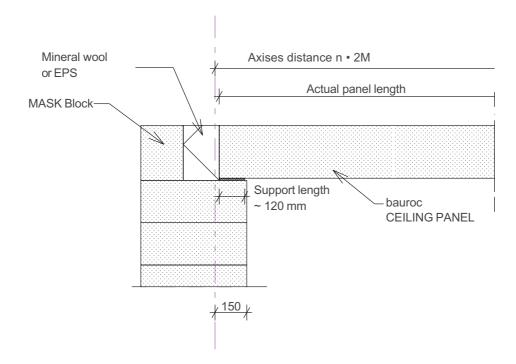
Panel support on bauroc ECOTERM + blocks on exterior wall
